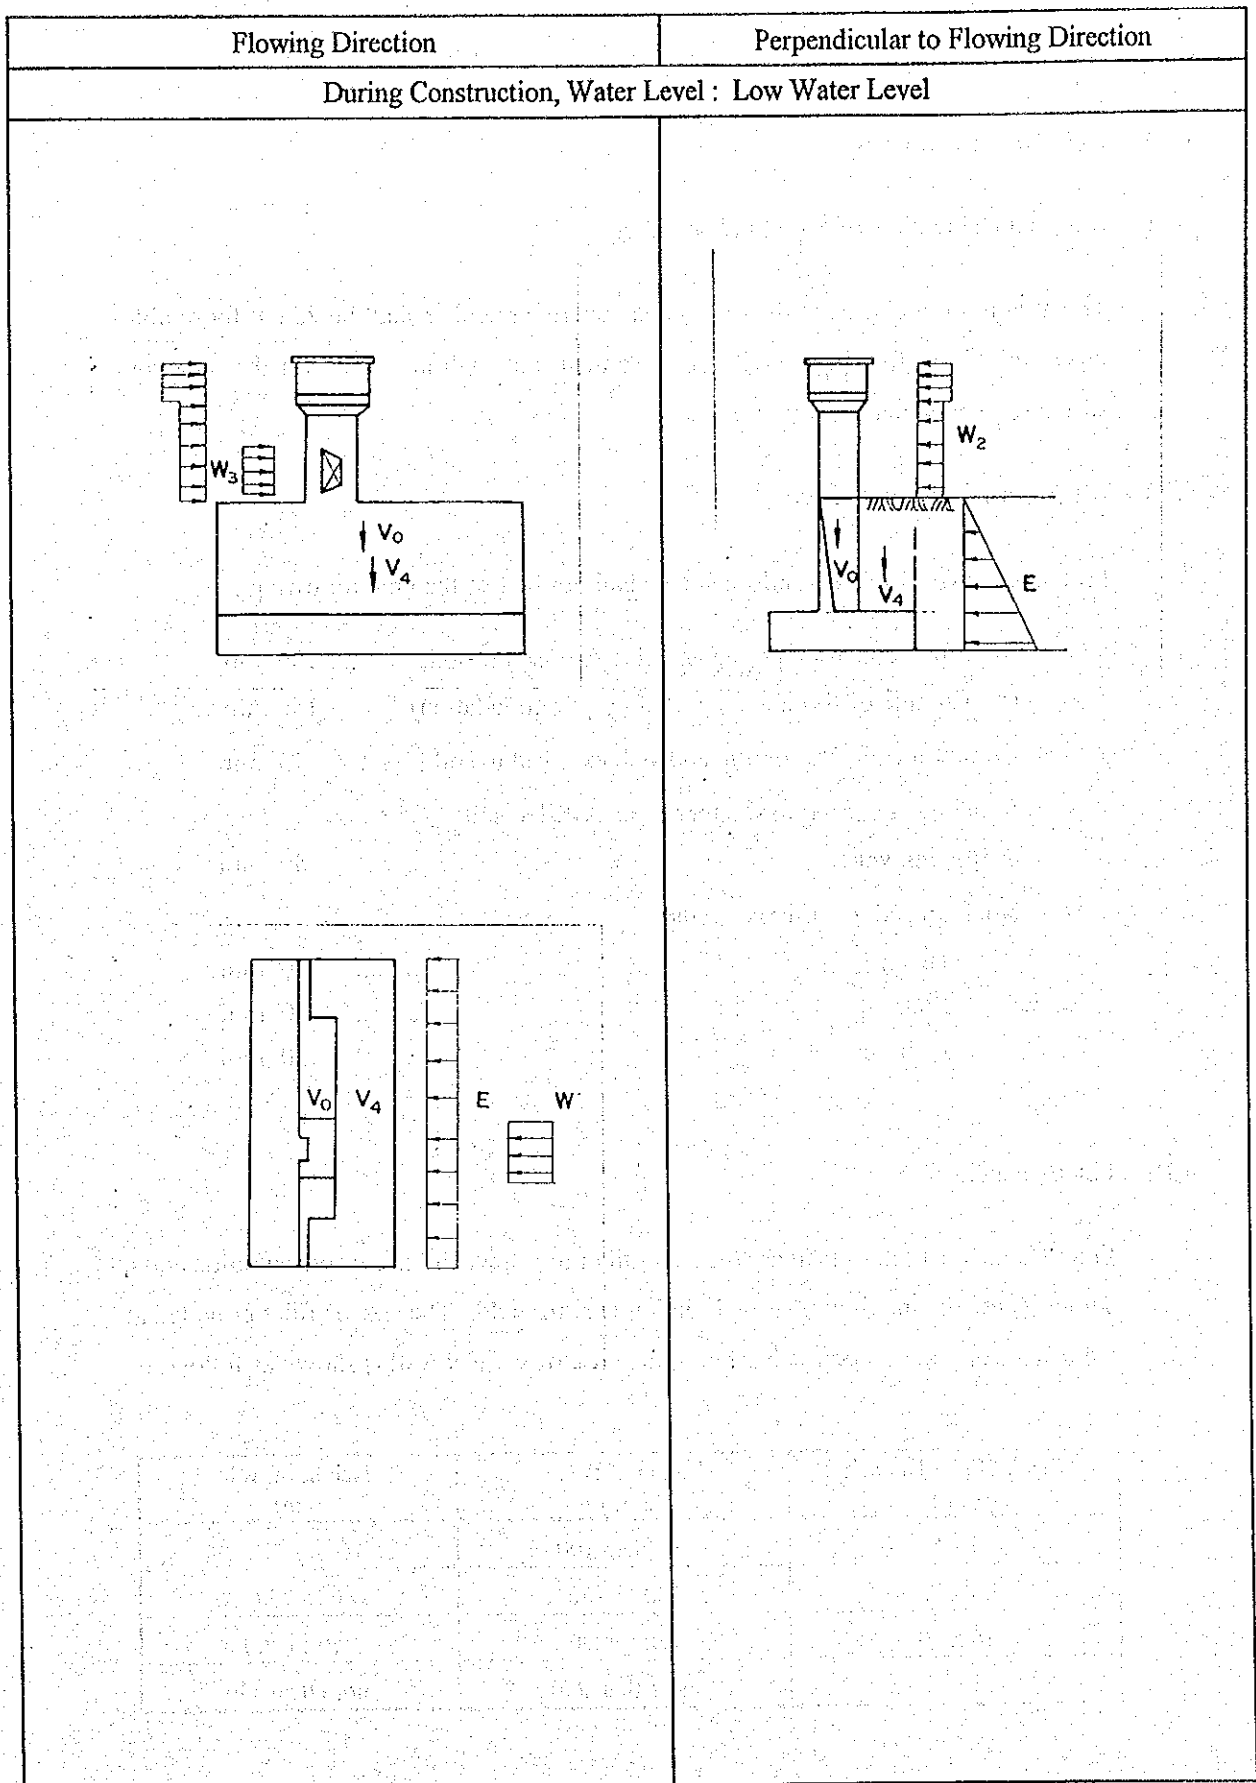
(4/4) Loading Conditions for Side Piers of Weir
